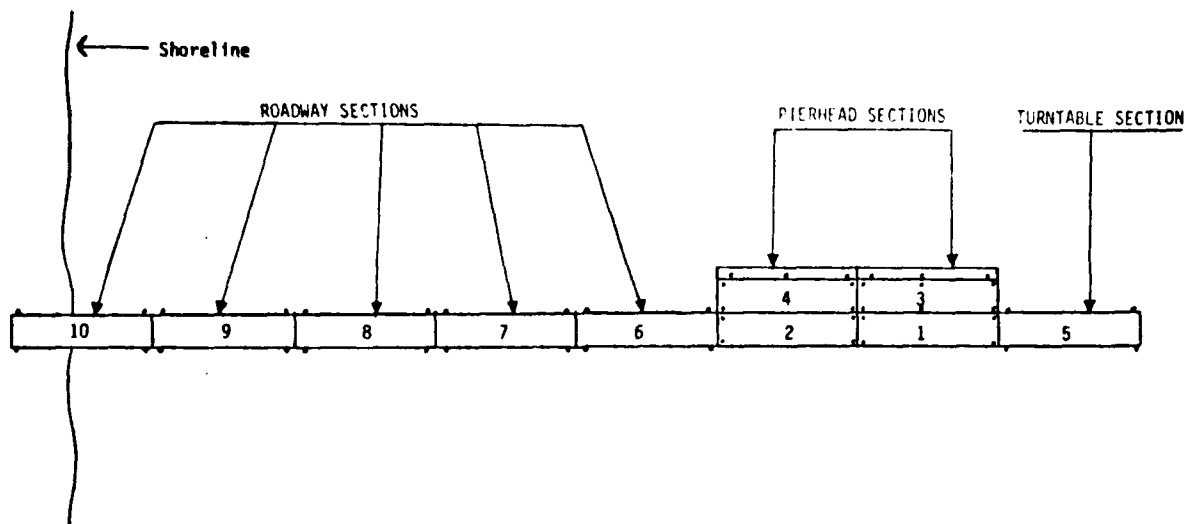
CAUSEWAY SECTIONS ARRAY
